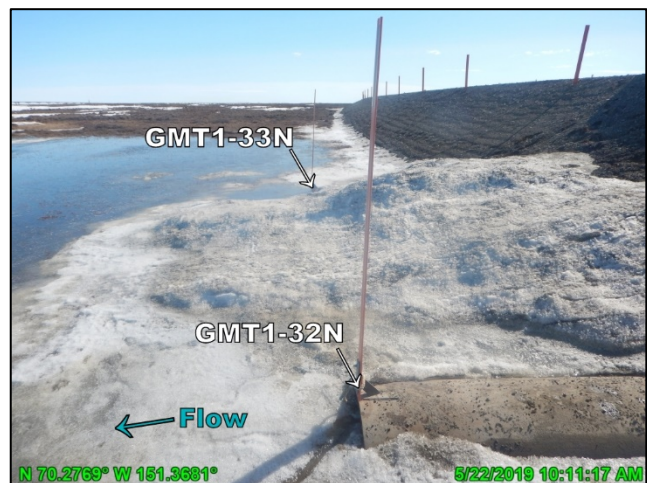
Culverts GMT1-32 and 33 impeded by ice and snow buildup, looking southwest; May 22, 2019
